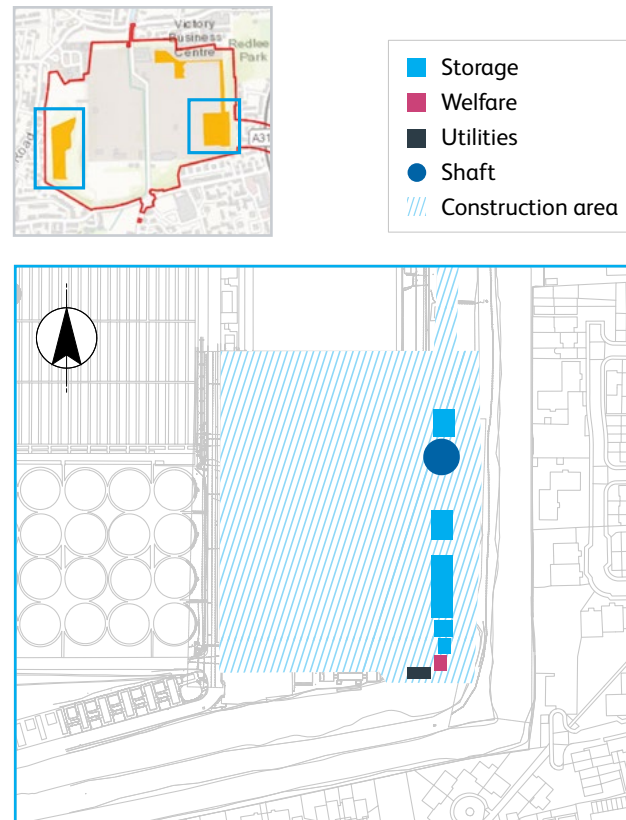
Indicative proposed Mogden STW construction site layout (Eastern Work Area)
